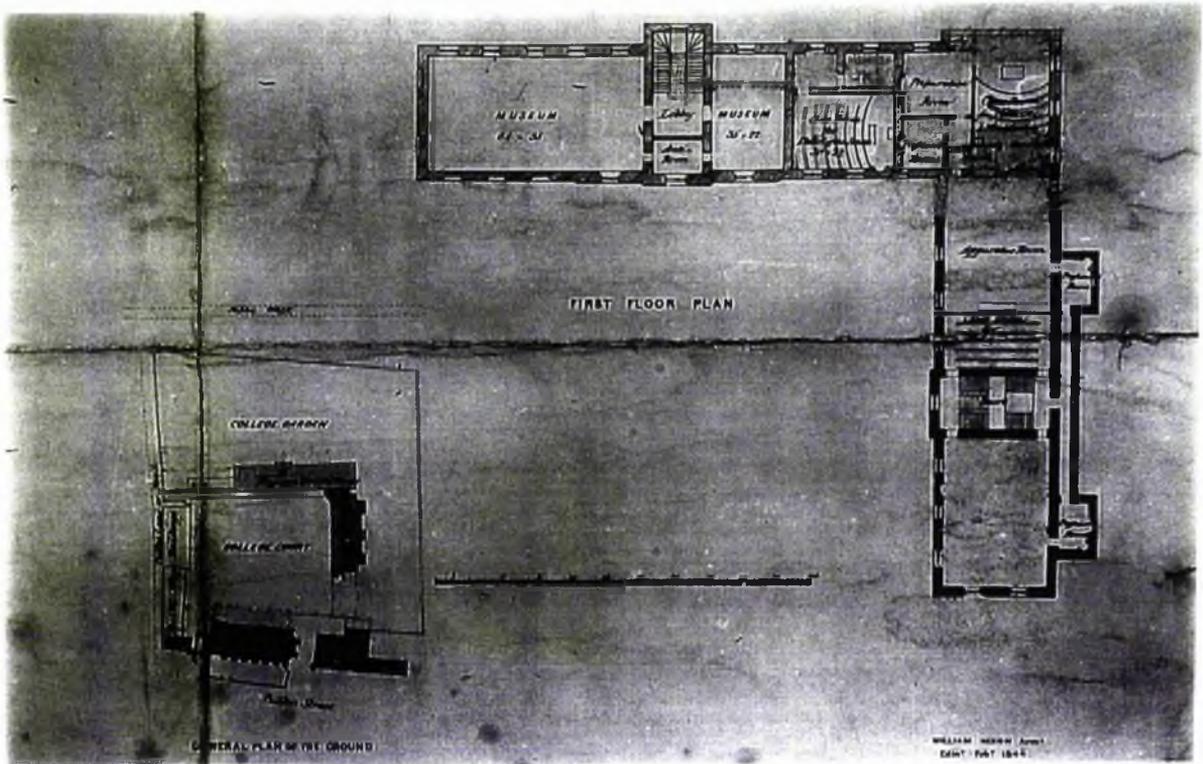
United College. Amended first floor plan of north building. W. Nixon, February, 1845.
